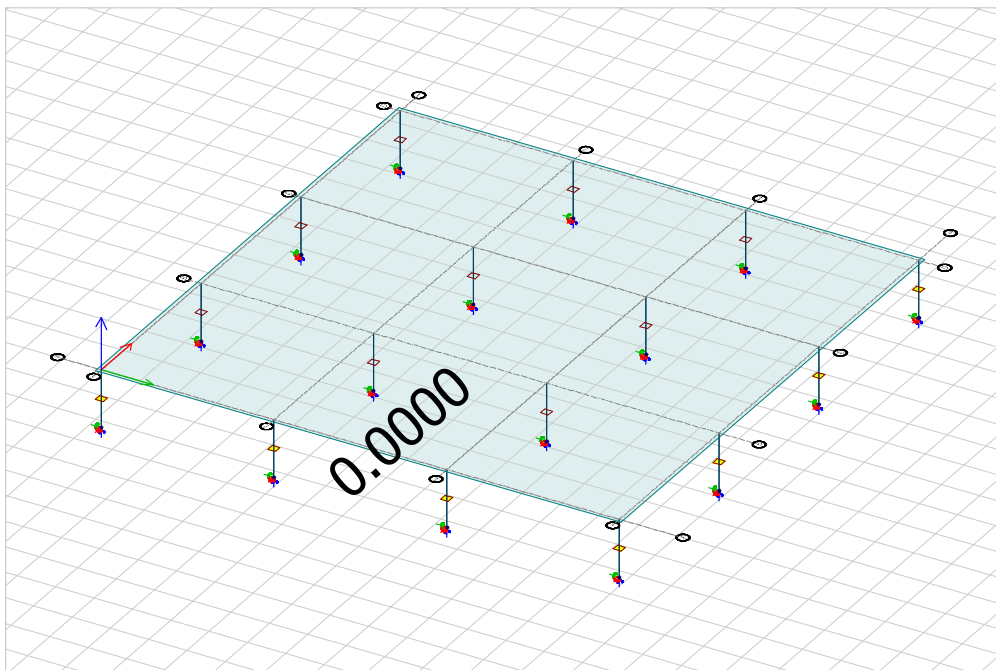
Cracking considered - RC shell - Crack width - bottom - Load comb.: SLS - [mm]
